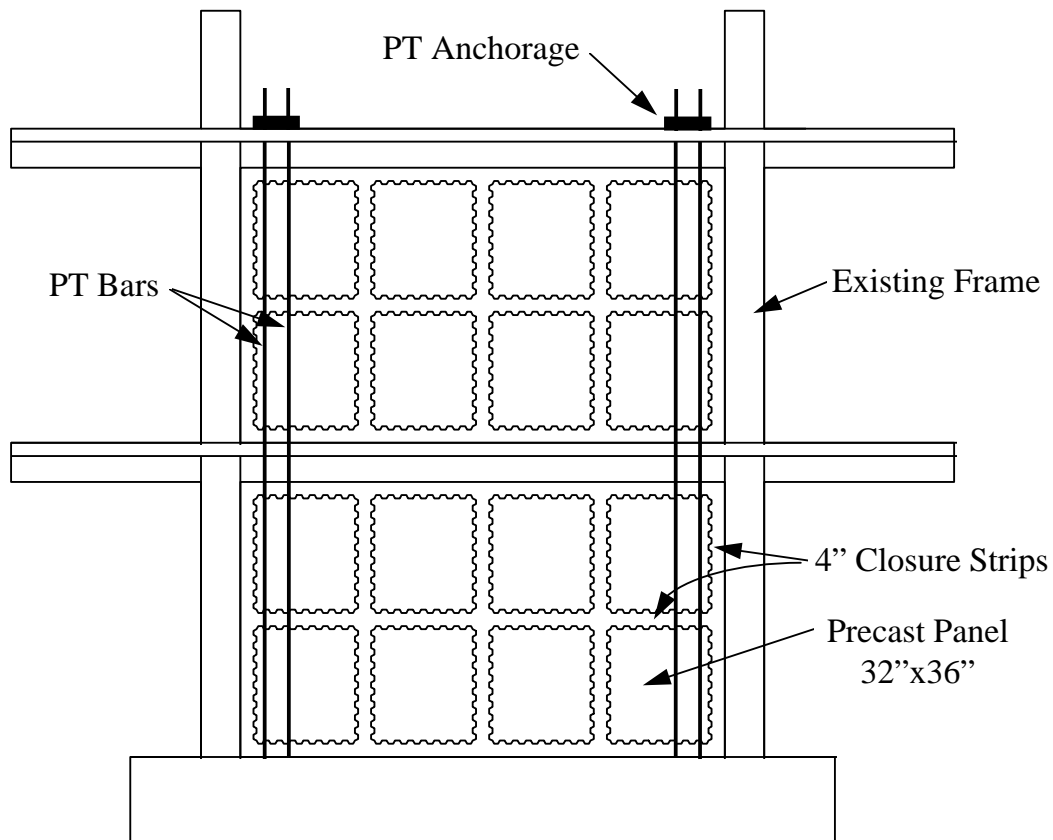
Infill Wall Installed in Original Frame^[6]
